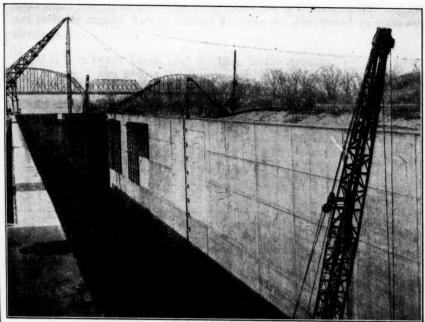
CONSTRUCTION VIEW OF AUXILIARY LOCK 41, LOUISVILLE, KY.
